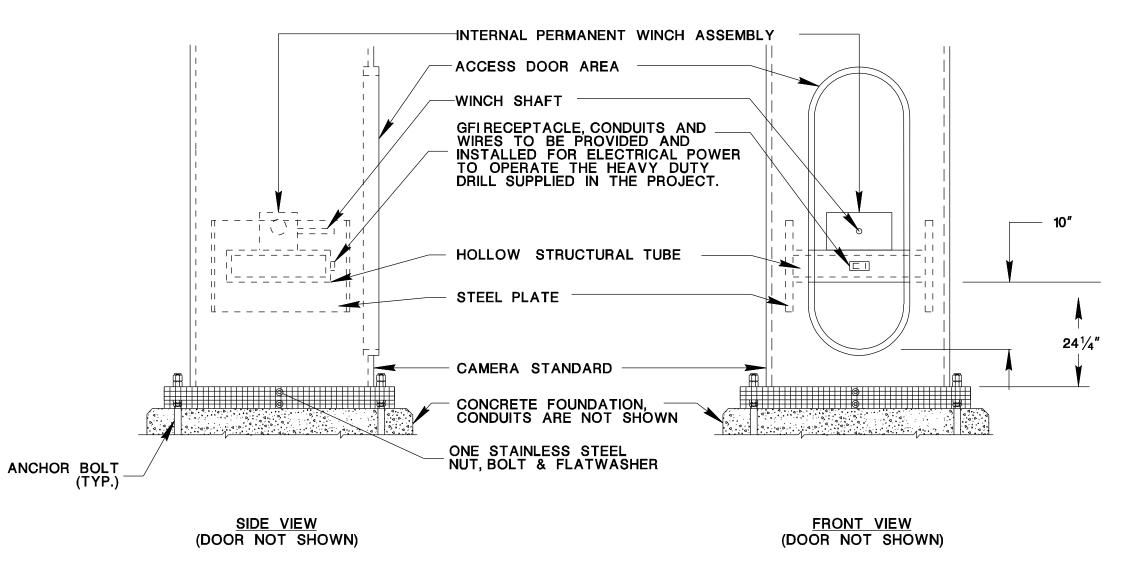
PLATE ASSEMBLY AND WELD SIZE TO BE DETERMINED BY THE MANUFACTURER TO ENSURE THE ASSEMBLY CAN WITHSTAND ALL LOADS FROM WINCH/CAMERA LOWERING DEVICE SYSTEM.
